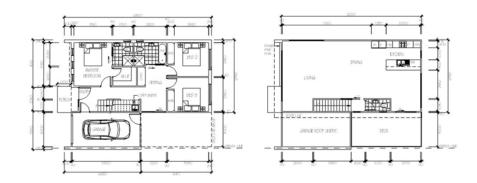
General floor layout (with minor modifications) Units 2-5 (G Hills & Partners Architects, 2020)
